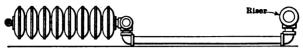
Flexible connection, plan view—used when riser has considerable vertical movement.
